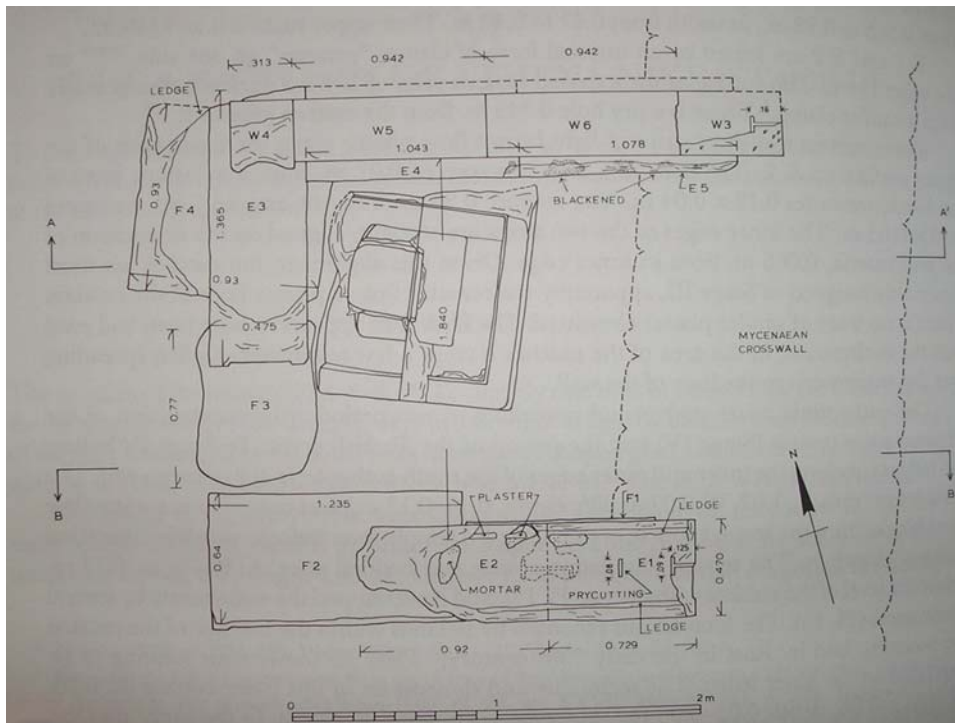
State plan of naiskos foundations and statue base (Mark 1993)
